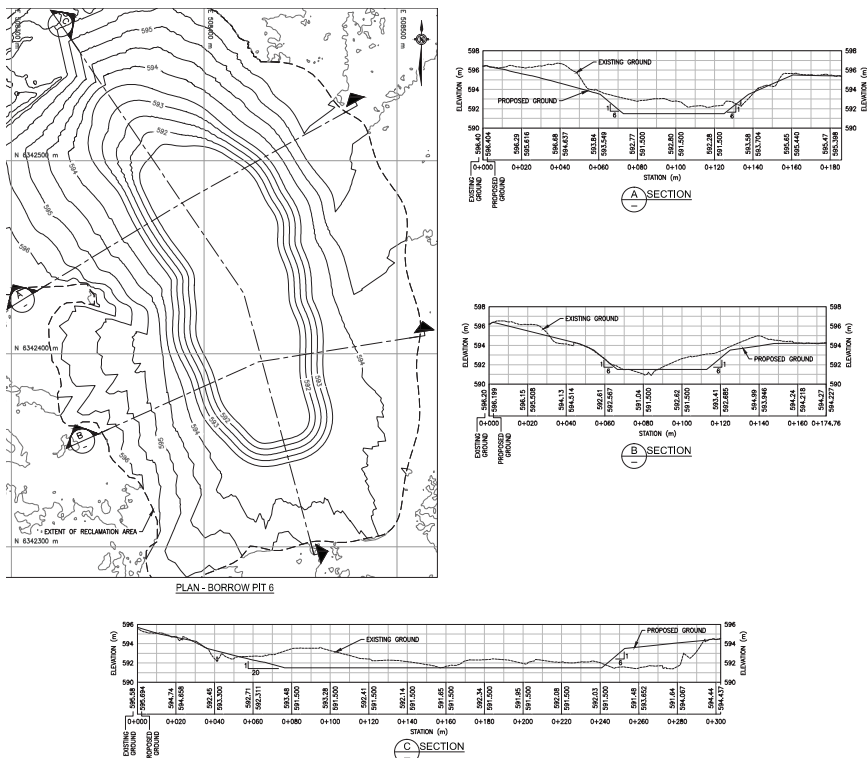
Cross-Sections of the Proposed Borrow Pit 6 Reclamation Area
